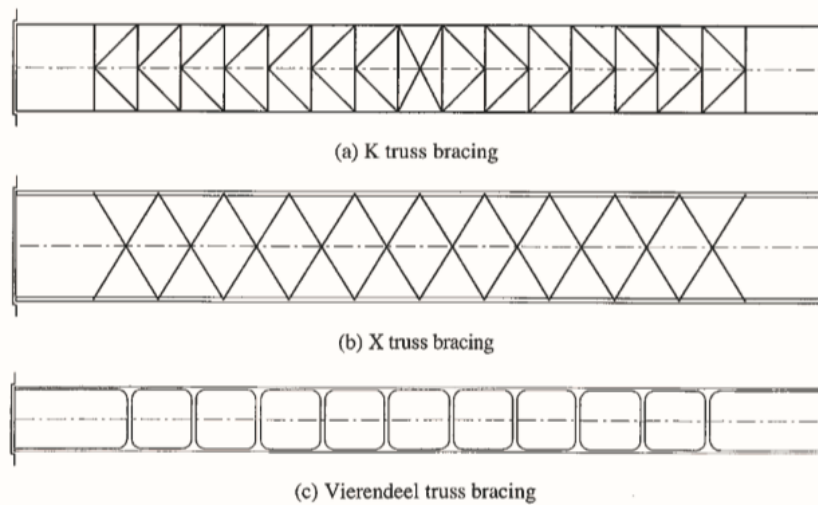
Top view of different bracing types between arches (Jean-Paul Lebet, 2013). (a) K-truss bracing (b) X-truss bracing (c) Vierendeel truss bracing
